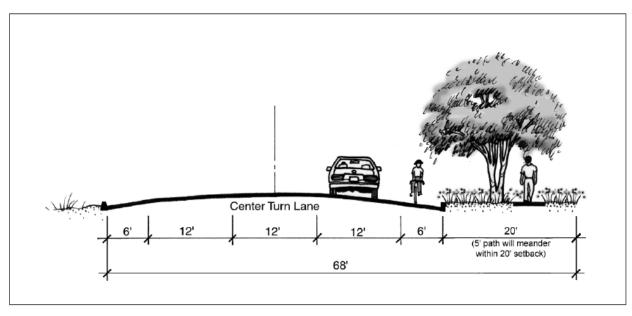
B ORCUTT ROAD FROM JOHNSON AVENUE TO HANSEN LANE AT CULVERT/CREEK CROSSING
